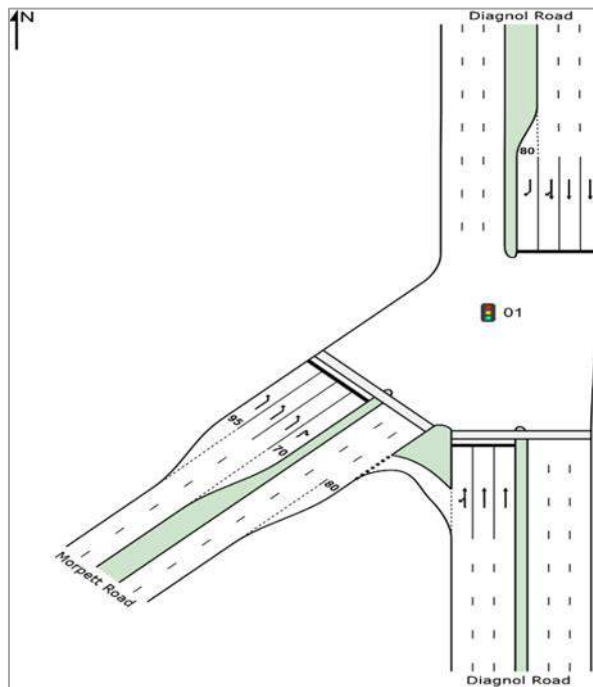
Swimming centre intersection layout (Diagonal Road and Morphett Road)
